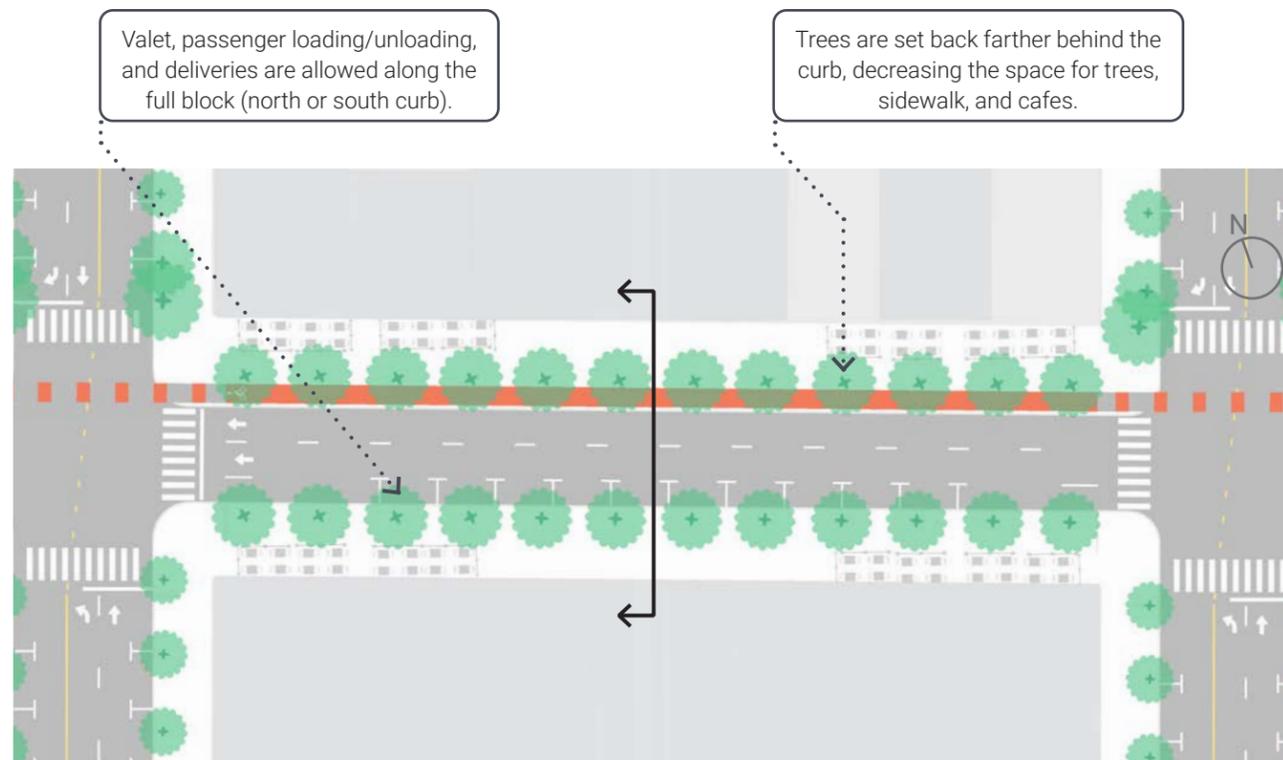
Typical Block Alternative – Westbound Bike Lane, Parking and Loading along full block
